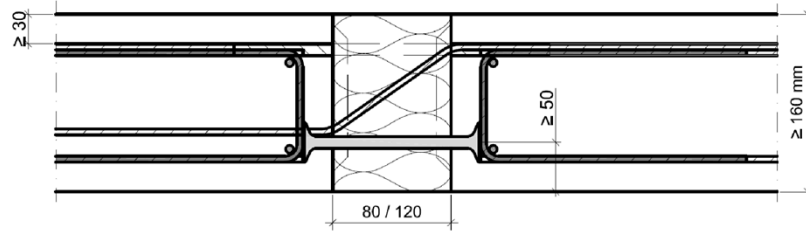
Example of Schöck Isokorb® Type K with SCE with vertical reinforcement according to section D.1.1
